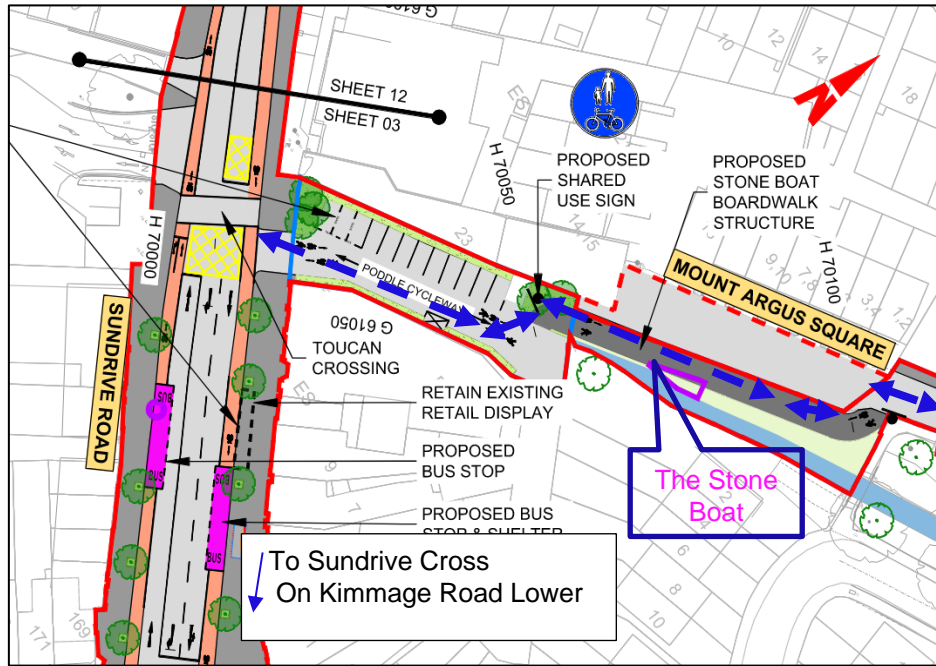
The Poddle Cycleway Link from Sundrive Road to Mount Argus with the proposed Stone Boat Boardwalk
